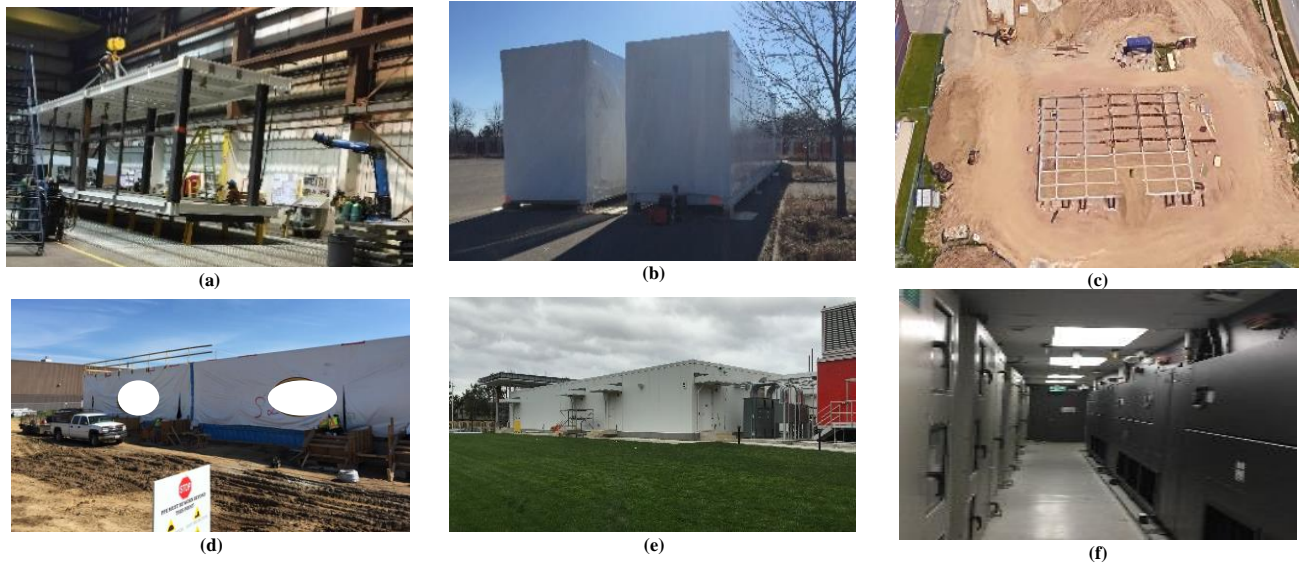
The main case study project during: (a) fabrication and assembly processes, (b) temporary storage area, (c) site preparation and building concrete foundations, (d) erection phase, (e) completed building from outside, and (f) finished structure from inside.
